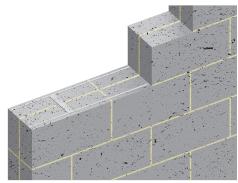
Bed joint reinforcement used to tie the leaves together in a blackwork collar jointed wall.
